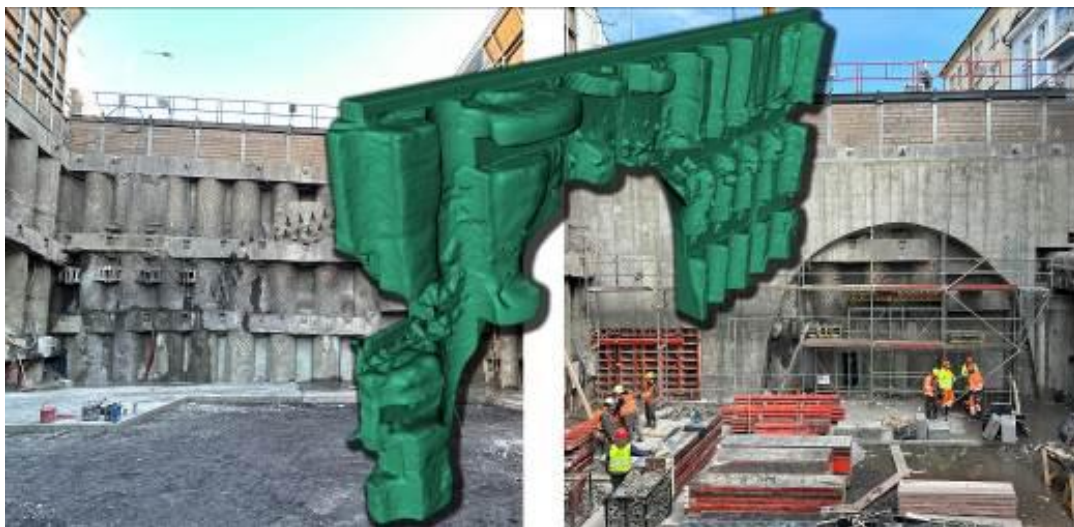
Front wall of the south escalator tunnel – before concrete pouring, structural model, and after concrete pouring
